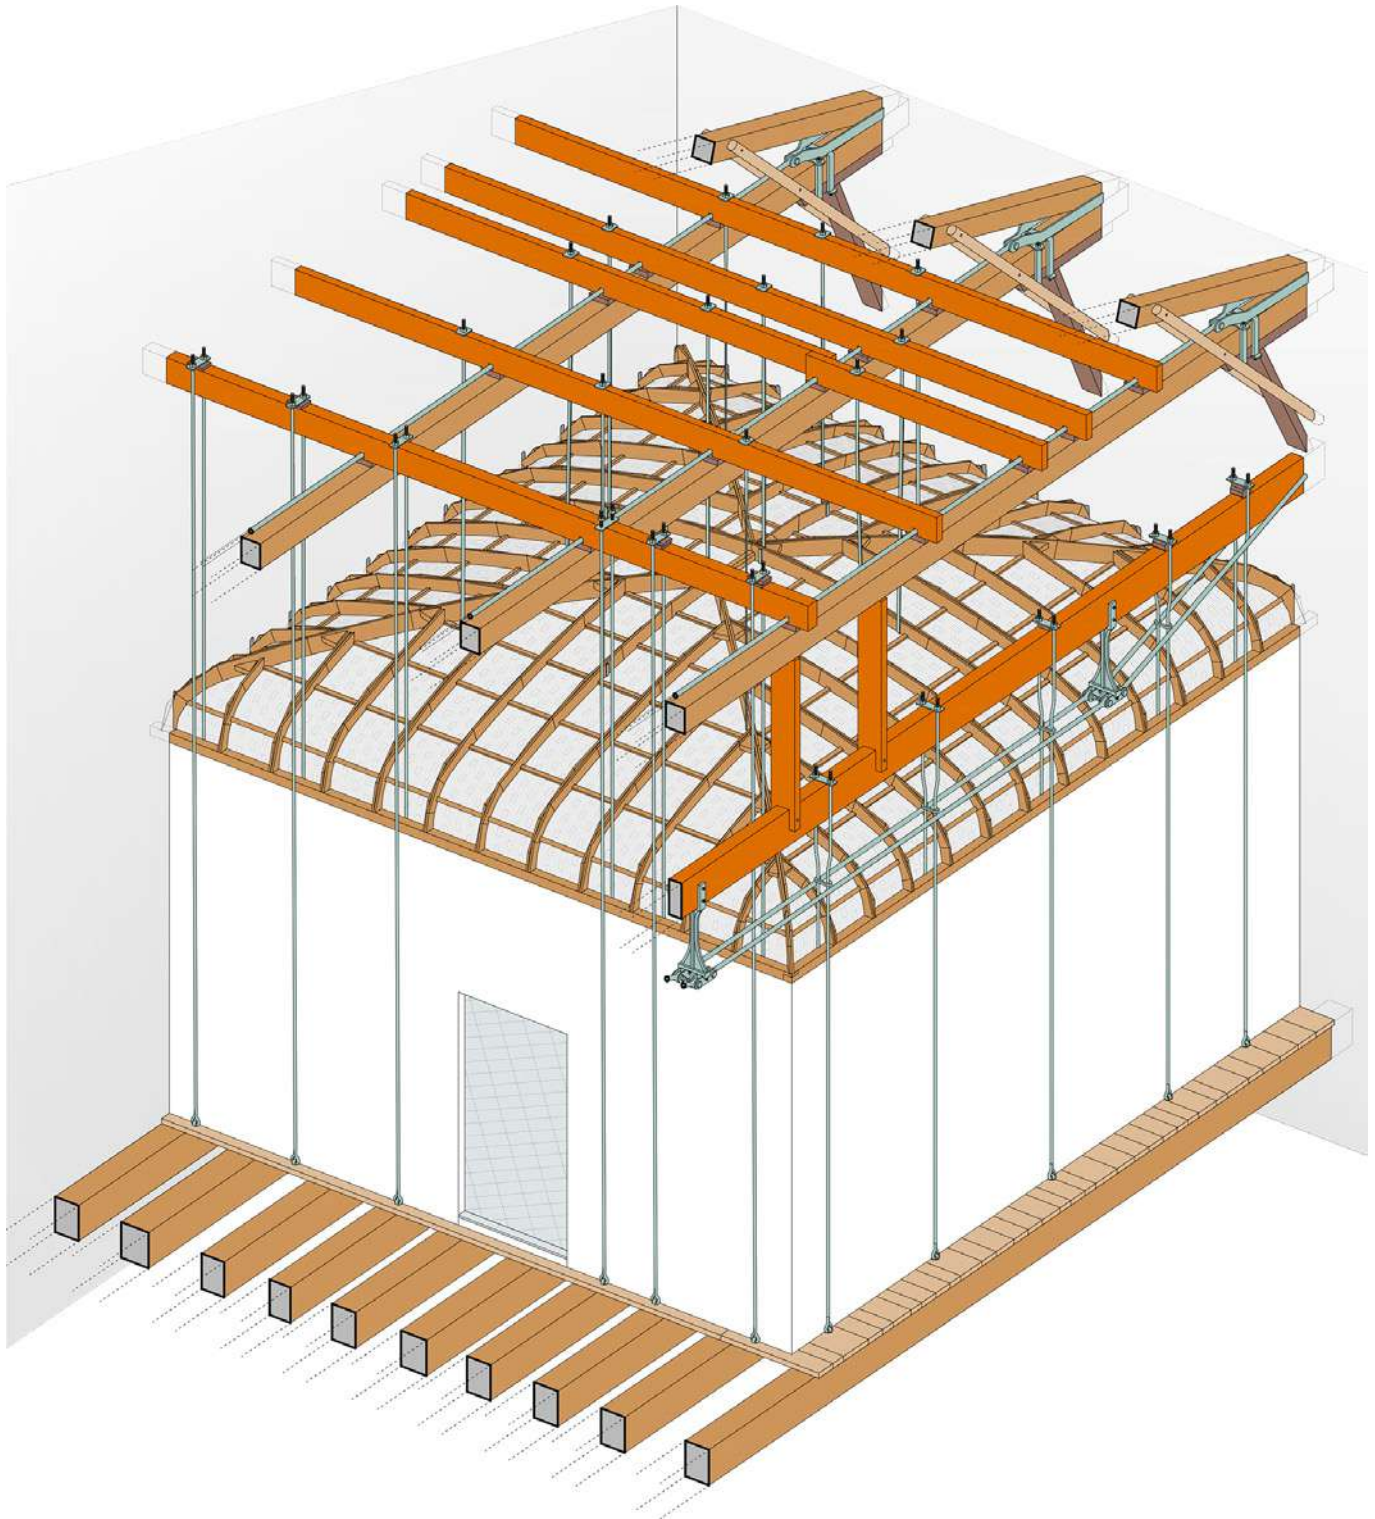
Construction scheme of thin-tile brick partitions, corresponding timber vaulted ceiling, and connections to the roof timber trusses on the second storey of palazzo Butera. The average cross dimensions of floor beams are 0.25 m x 0.35 m, while the distance between beam axes is 0.70 m.
